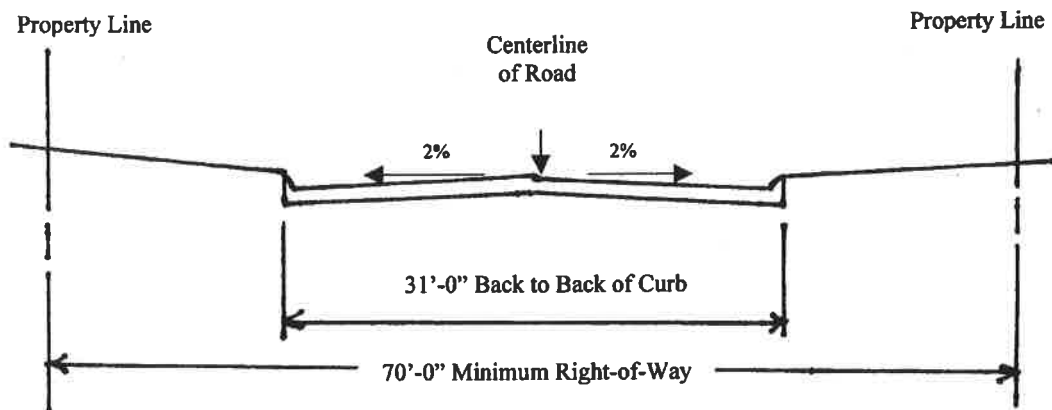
Typical Urban Road Cross-Section (Pavement with Curb and Gutter).
